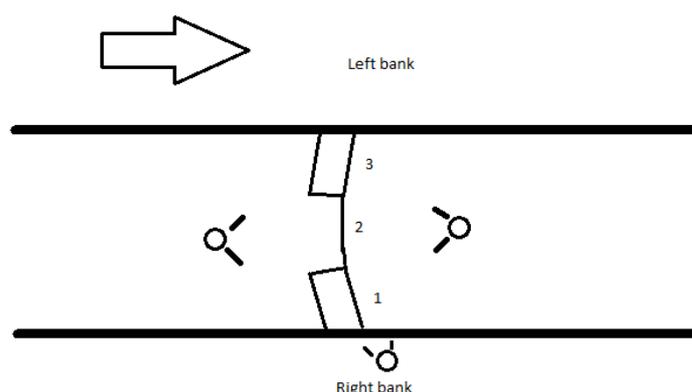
Site plan for Brazil Mill Woods Barrier 2
